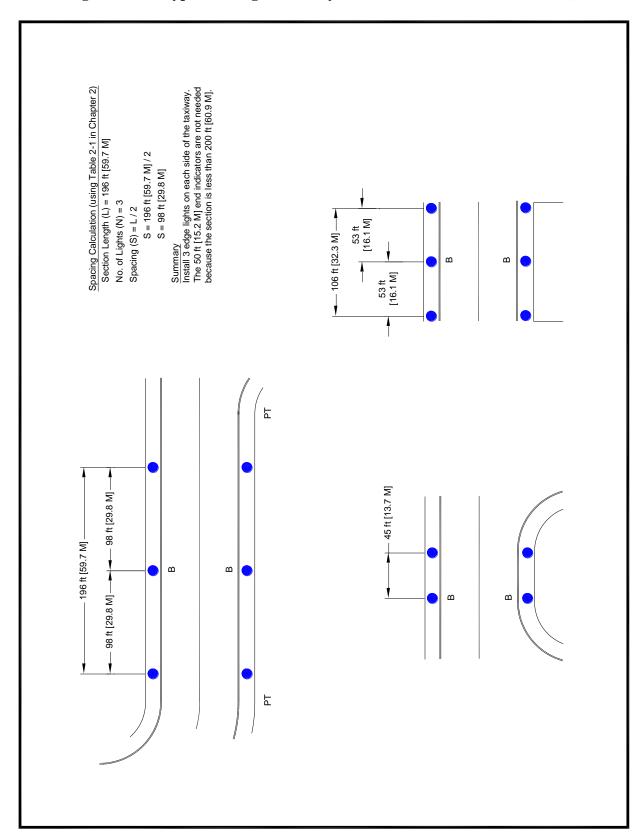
Typical Straight Taxiway Sections (Less Than 200 Ft. (61 m))
